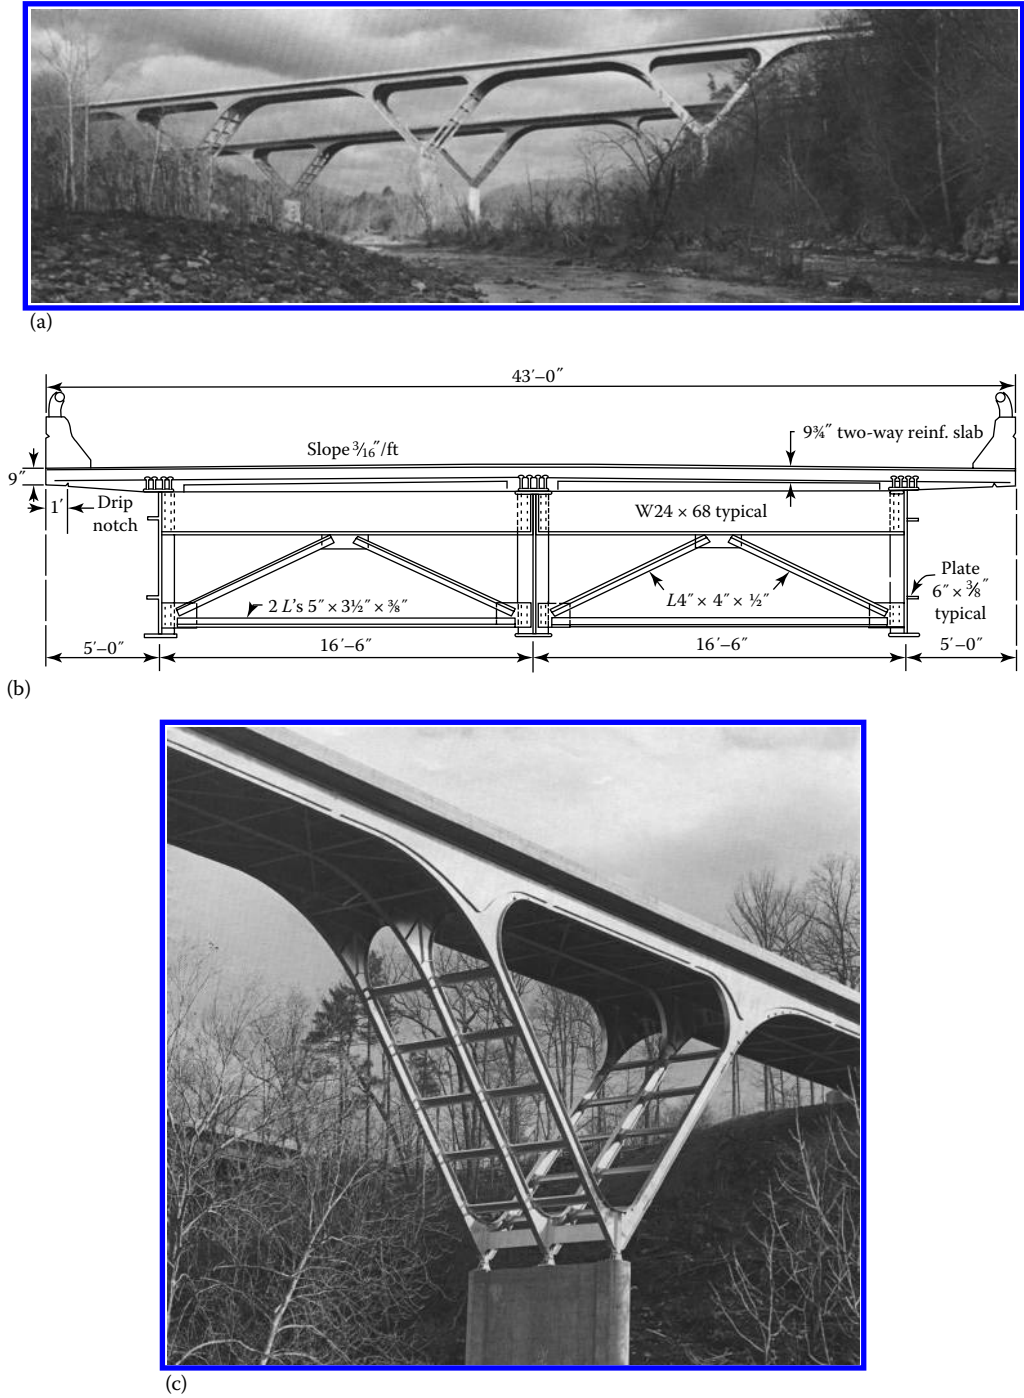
(a) A multi-span welded delta-frame bridge on I-64 near Lexington, VA. (Courtesy of Bethlehem Corporation, Easton, PA.) (b) Cross section of delta-frame bridge shown in Figure 6.11a. (c) Delta-section of a welded delta-frame bridge shown in Figure 6.11a.
